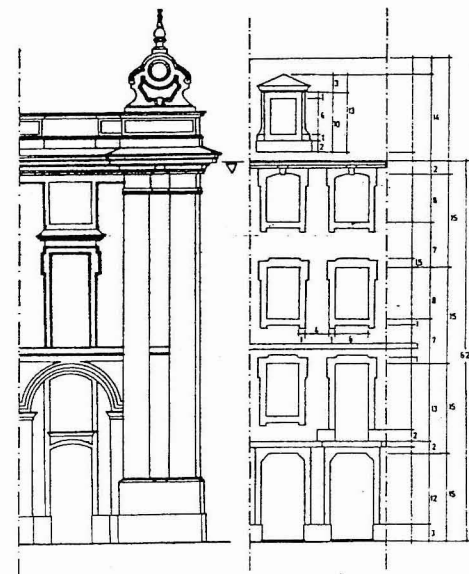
Typical construction of a Pombaline rentable building: 60 Ouro Street. (Drawing by Jorge Mascarenhas).
